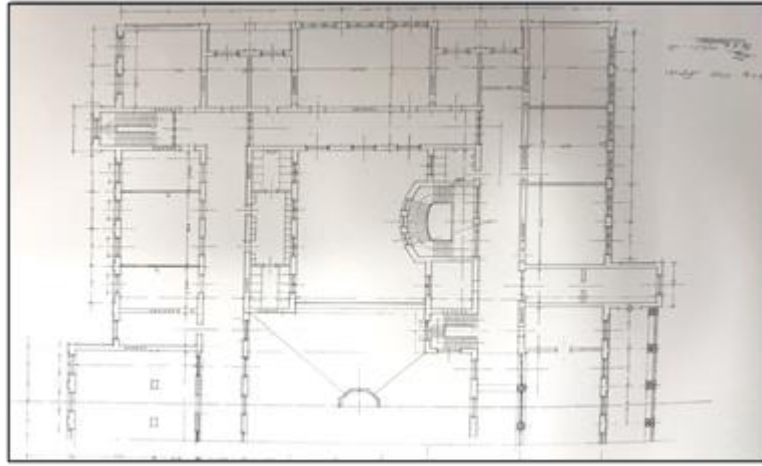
Gazi Education Institute, Second Floor Plan, (Yavuz, Y, *Empire to Republic Architect Kemalettin 1870-1927*, Source: GEEA)
